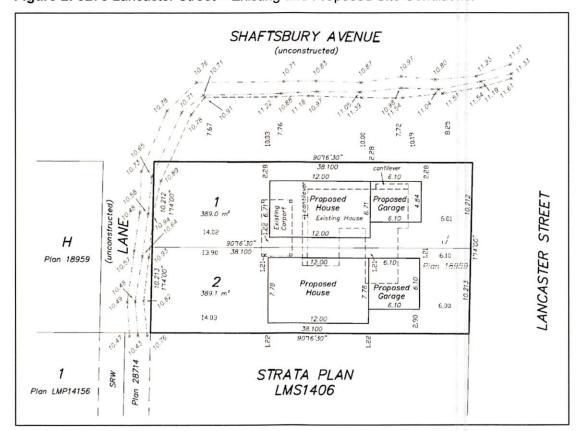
3273 Lancaster Street - Existing and Proposed Site Conditions.
